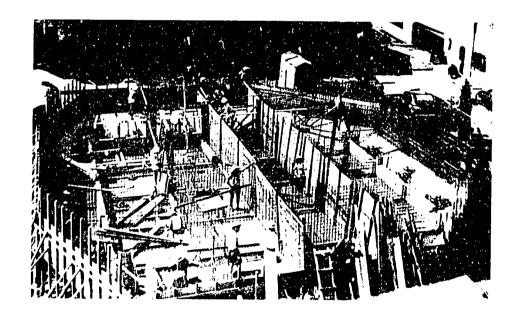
Floating concrete dock under construction at CARIC Shipyards - 1960.
